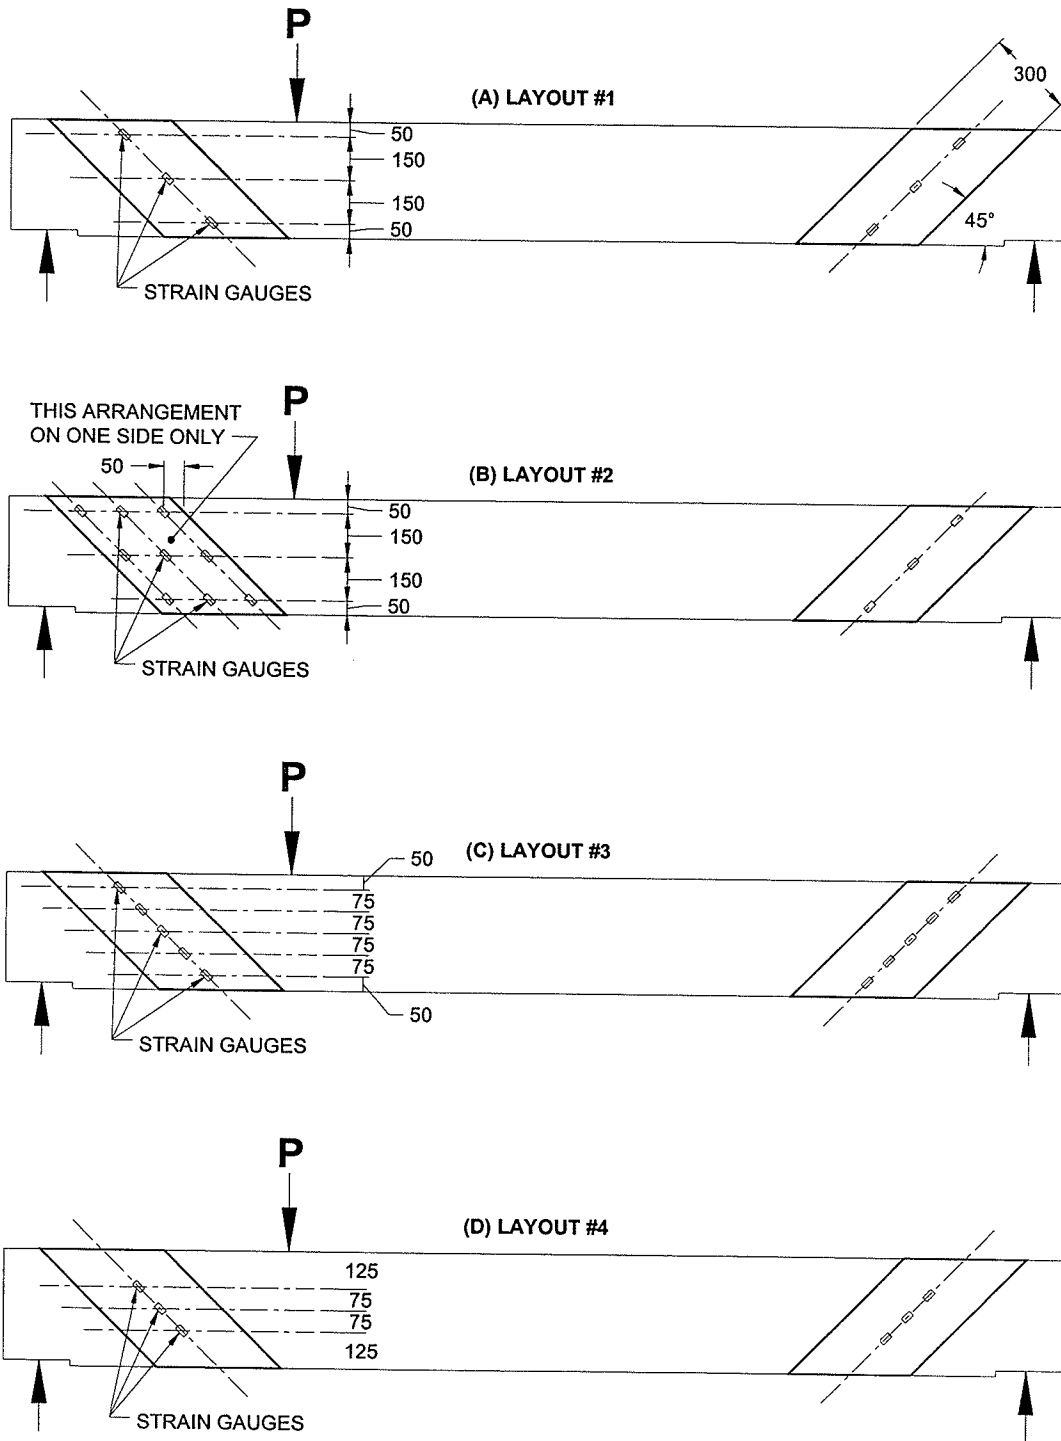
Diagonal sheet strain gauge layouts 1 to 4 (all dimensions in mm)
